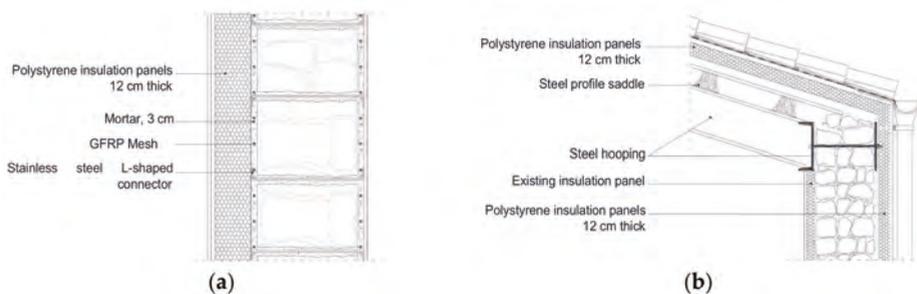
Detail of seismic and energy interventions on roofing and outer vertical walls (a) Case No. 1; (b) Case No. 2.
